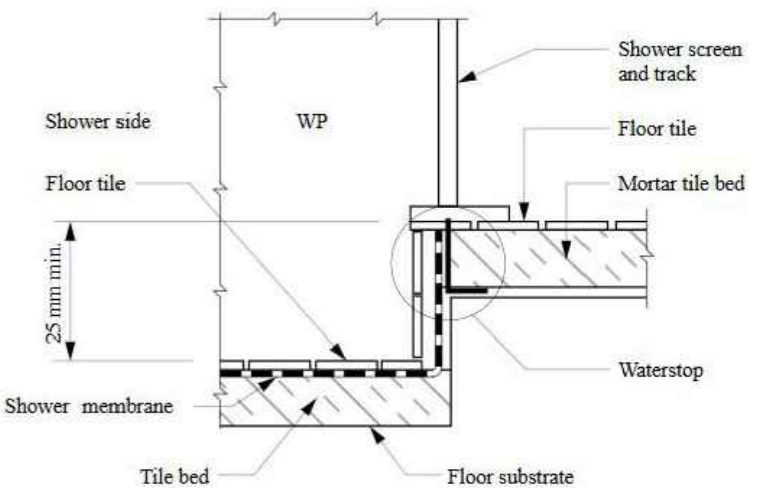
Typical unenclosed stepped down shower construction (membrane below tile bed)
